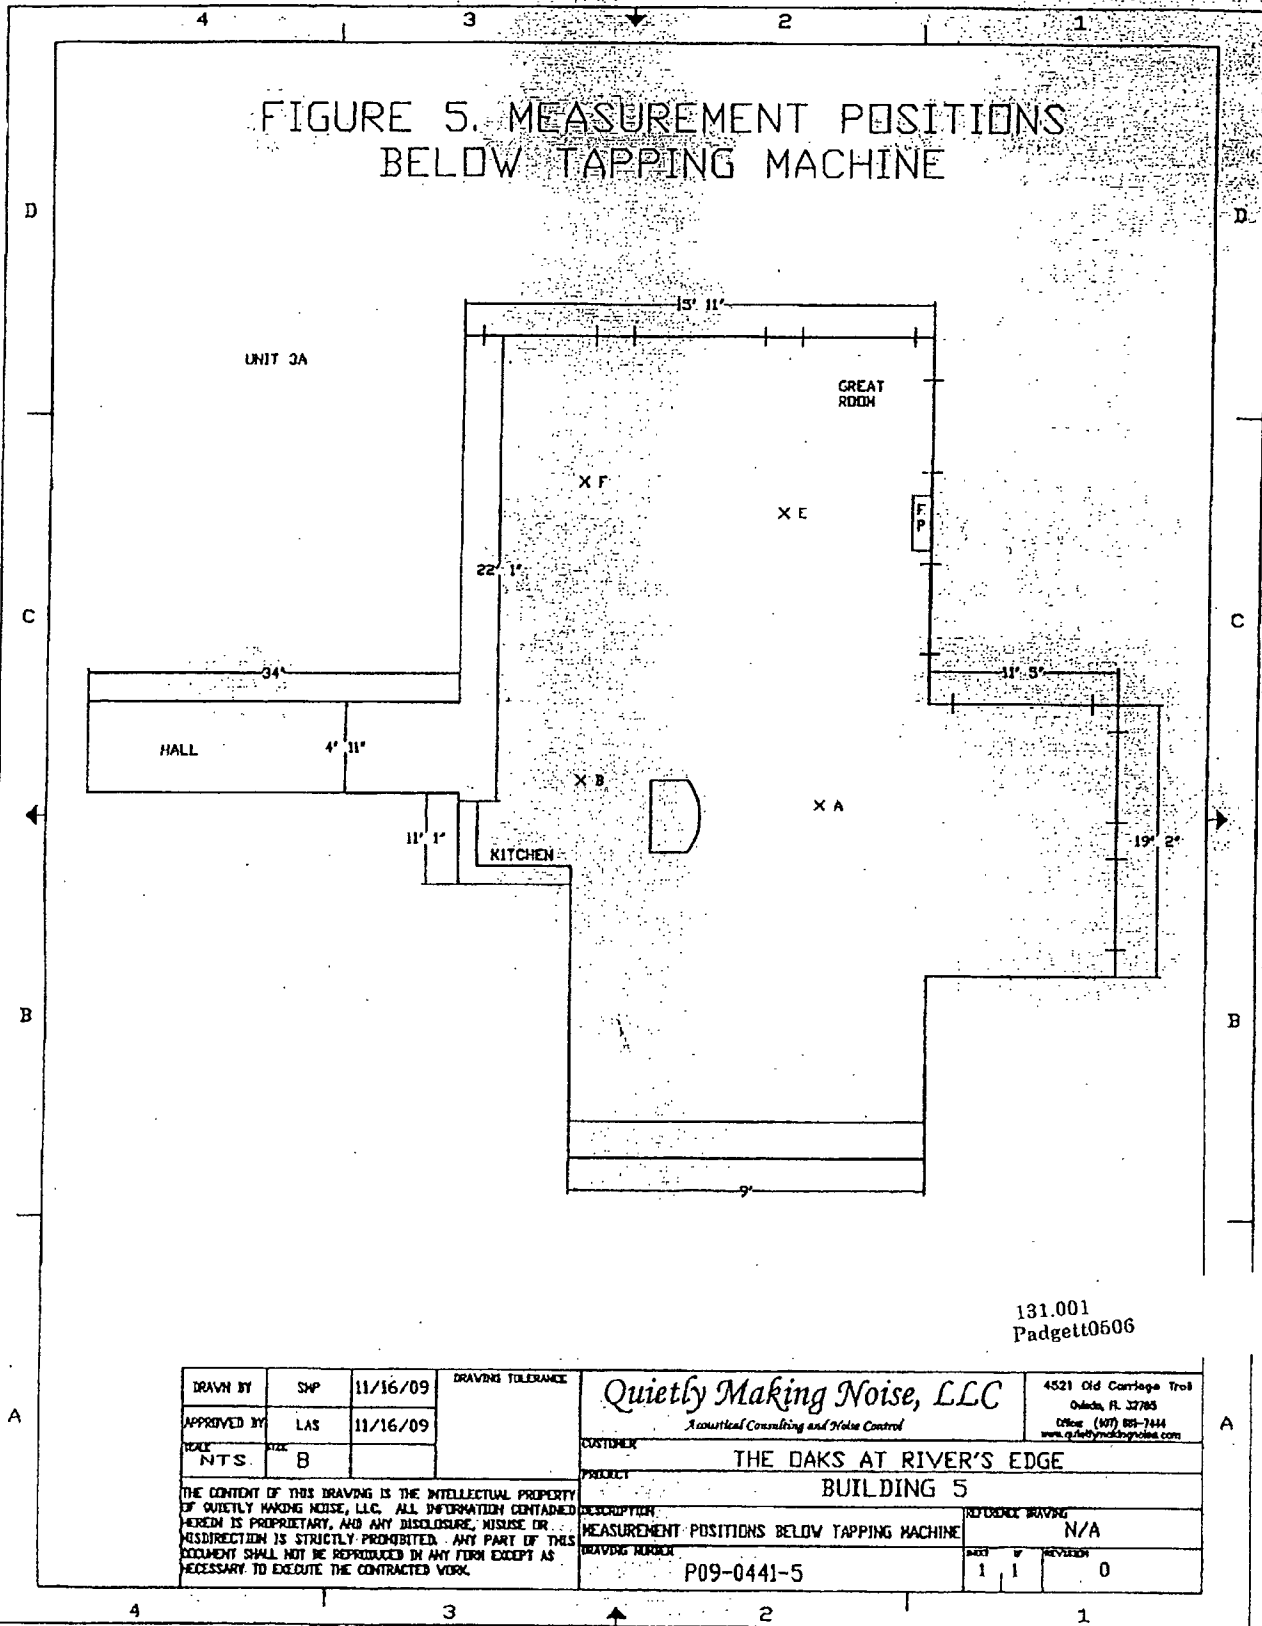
MEASUREMENT POSITIONS BELOW TAPPING MACHINE
